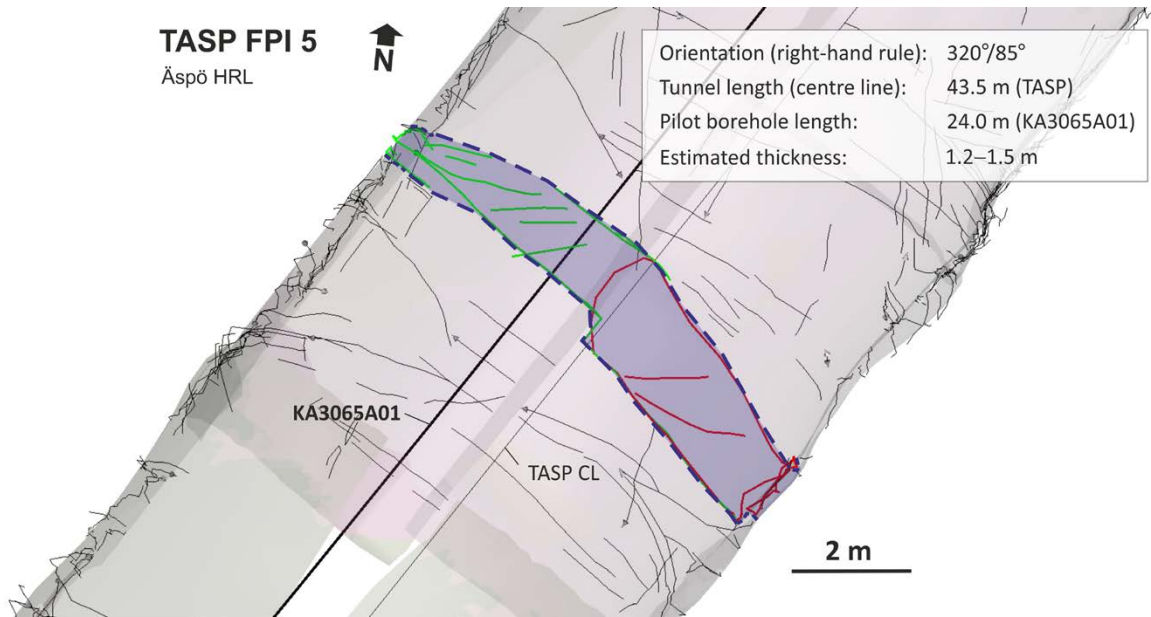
Plan view (ceiling and walls) of a proposed TDZ along a tunnel in the Äspö HRL. The TDZ extent is drawn on the tunnel surface in RoCS. See Figure A3-5 for additional details on the structure.
